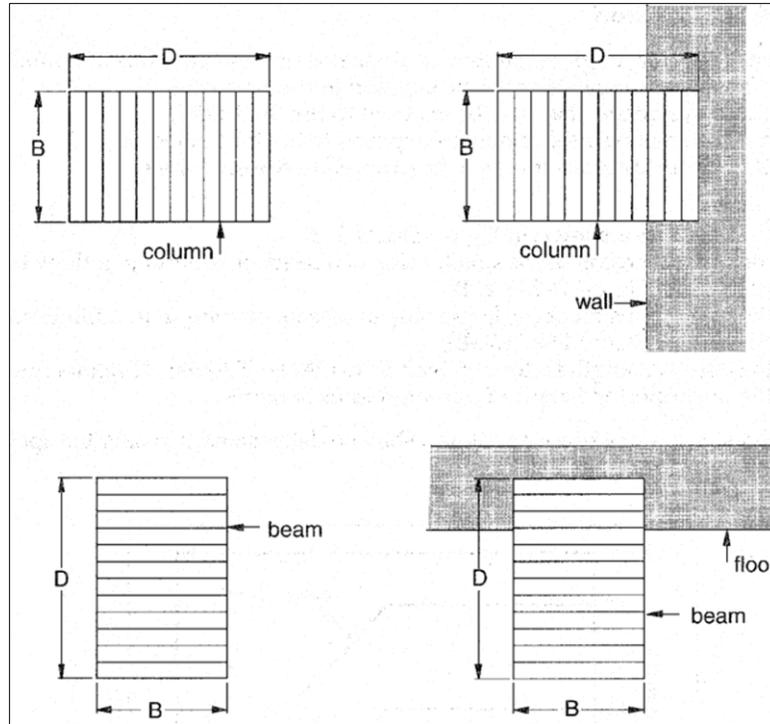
T.T Lie timber beams and columns nomenclature [34]
